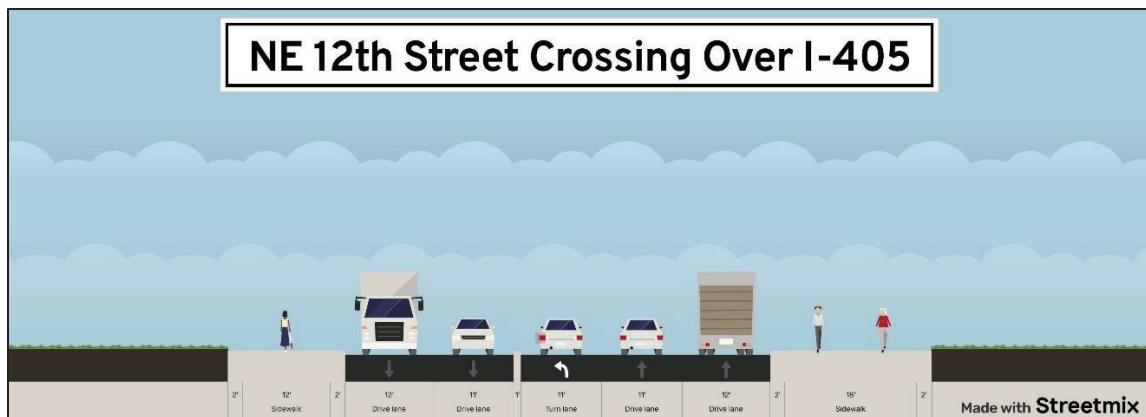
Existing NE 12<sup>th</sup> Street Cross-Section for the Crossing Over I-405 (facing west)
